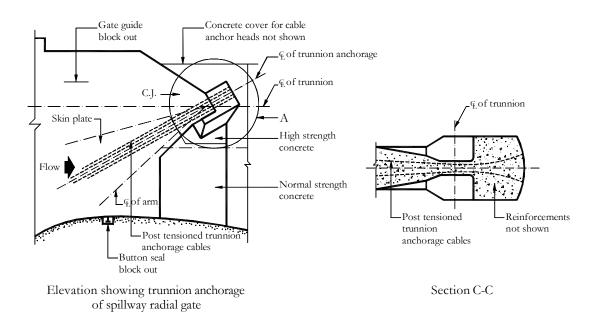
Elevation of trunnion anchorage of spillway radial gates
